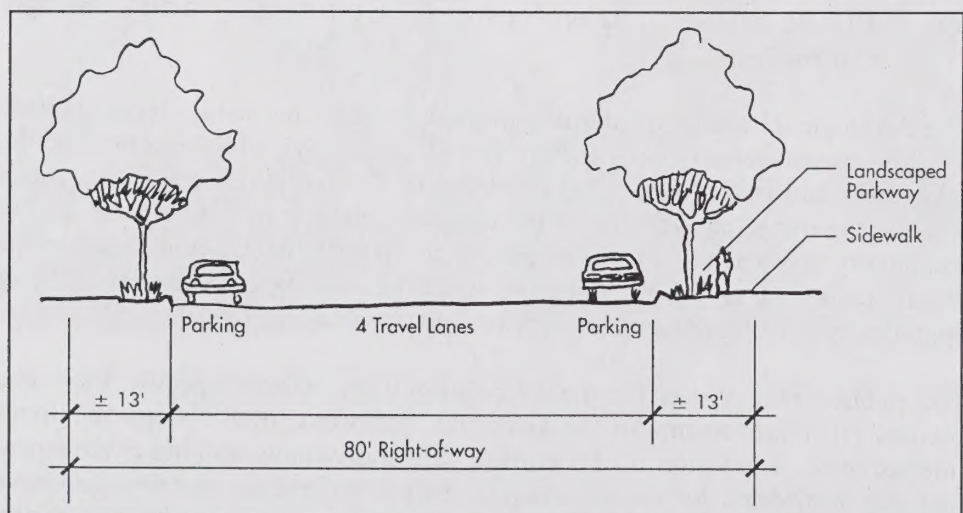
Existing street section along Fair Oaks Avenue North of Mountain Street (Districts 1 and 2) which has a right-of-way width of 80 feet. In addition to street trees, pedestrian lights and enhanced landscaping, the right-of-way width in these areas could include widened sidewalks or parkways.
